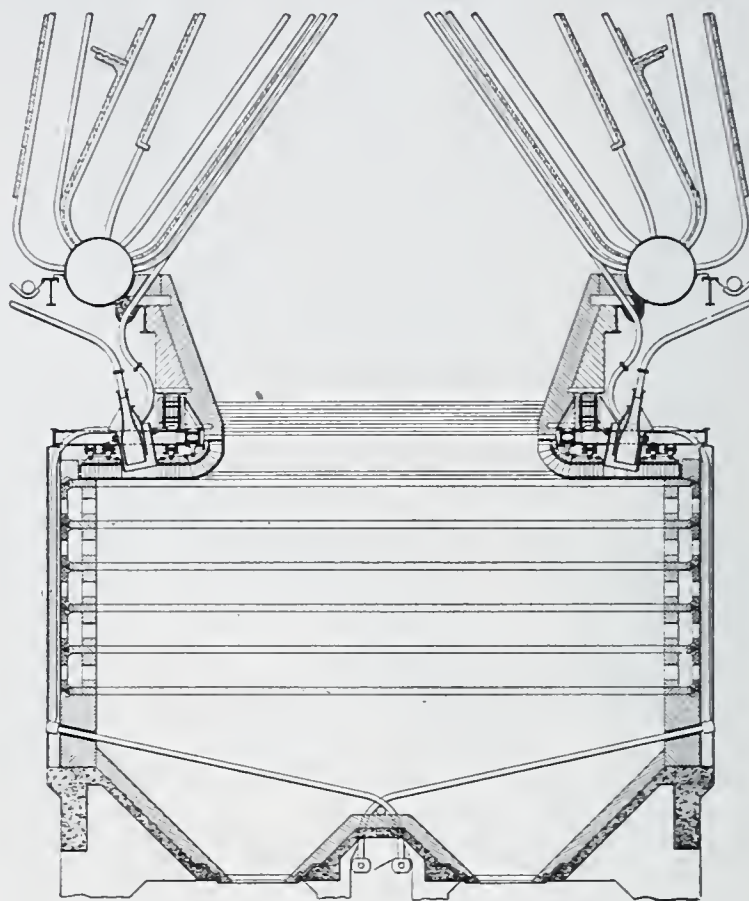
Suspended Arches in Connection with Pulverized-Fuel-Fired Double Stirling Boilers.
